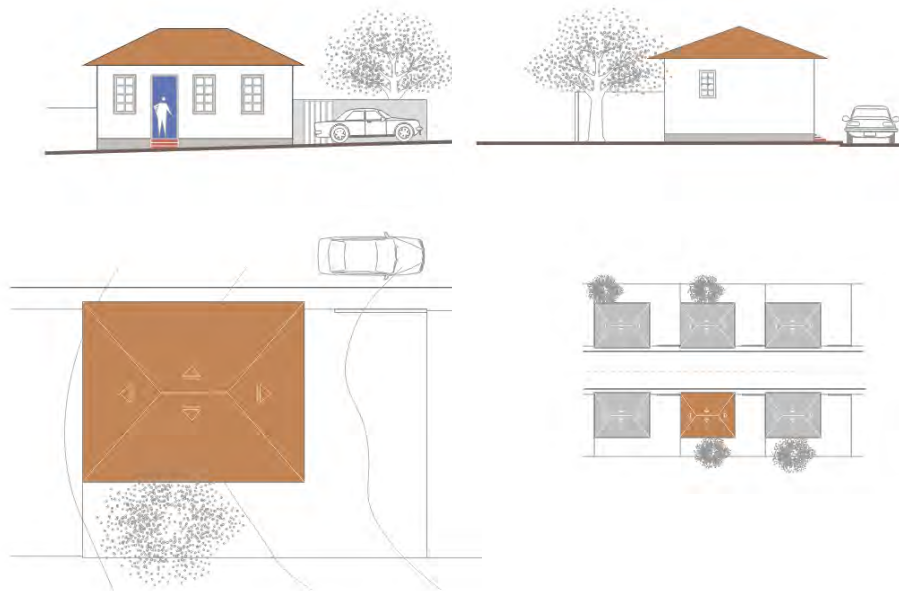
Isolated type. Schema of façades, building implantation and situation. Characteristics: frontal façade on the alignment of the street, as well as their entrance and main door; larger lateral spacing conducting to the backyard; narrow pavements separate the houses from the streets; roof of ceramic tiles, with four inclinations and small edges; and ceramic brick masonry walls. (Source: schemas produced by the authors, no scale).
